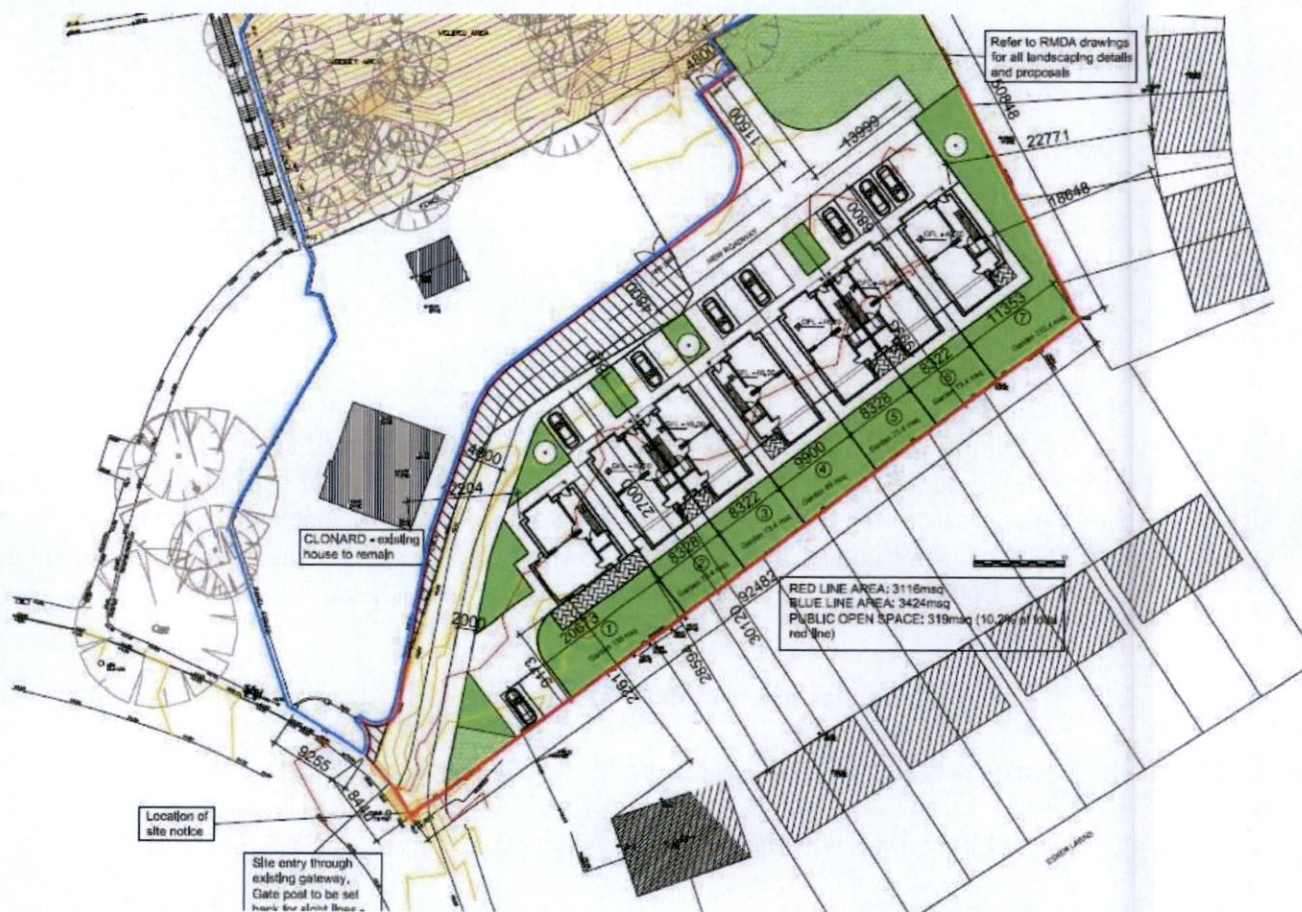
Site Layout Plan Submitted at Initial Planning Stage (prepared by CSA)
